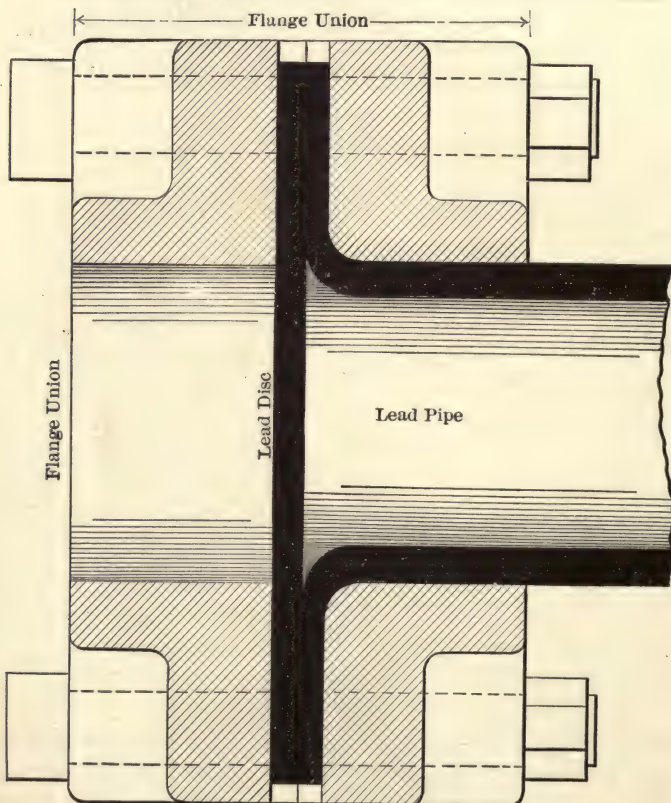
Method of closing end of lead pipe with iron flange union.
